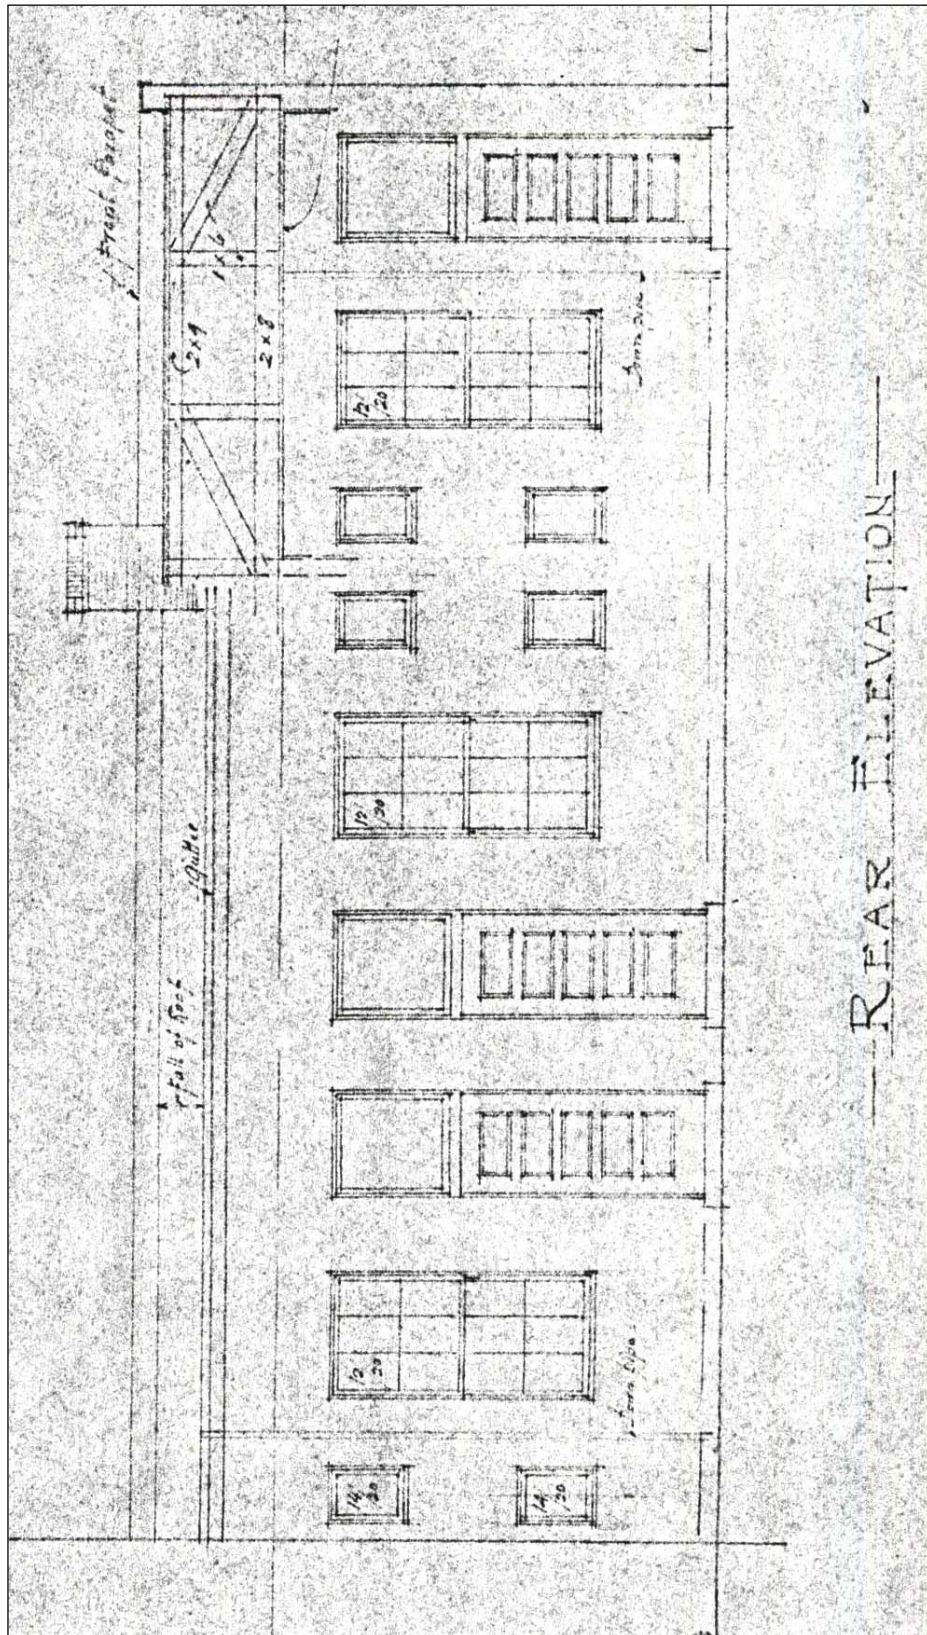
Architect's plans, #1650/1924, "Rear Elevation." (Courtesy of City Archives.)
